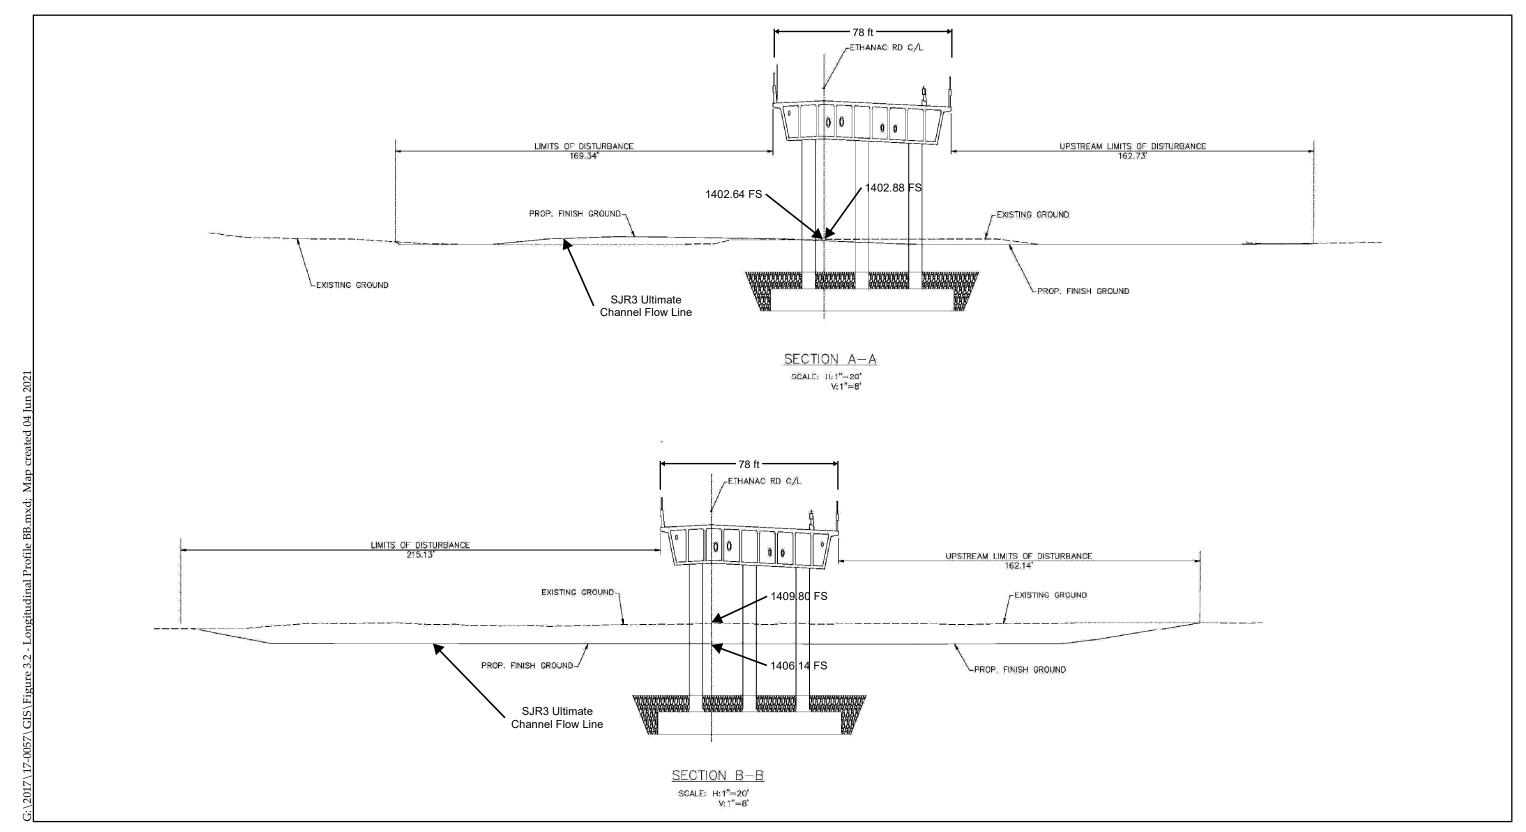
Sections A-A and B-B - Bridge Longitudinal Profile
